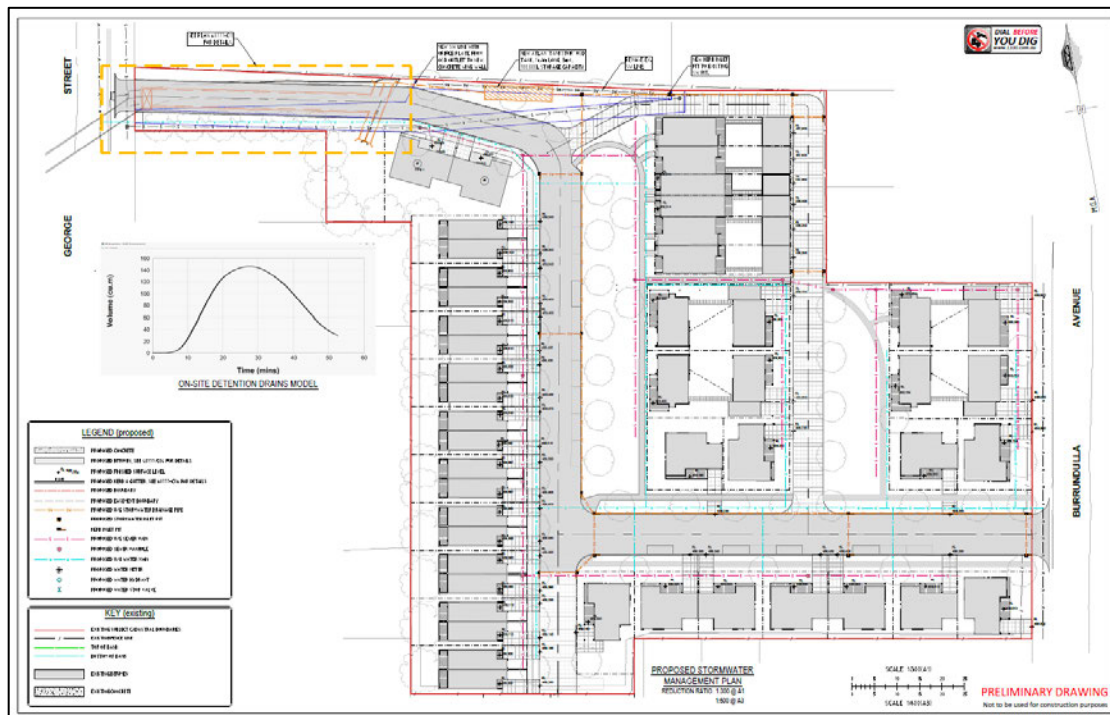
Stormwater Plans – Site Plan (source: Barson)
